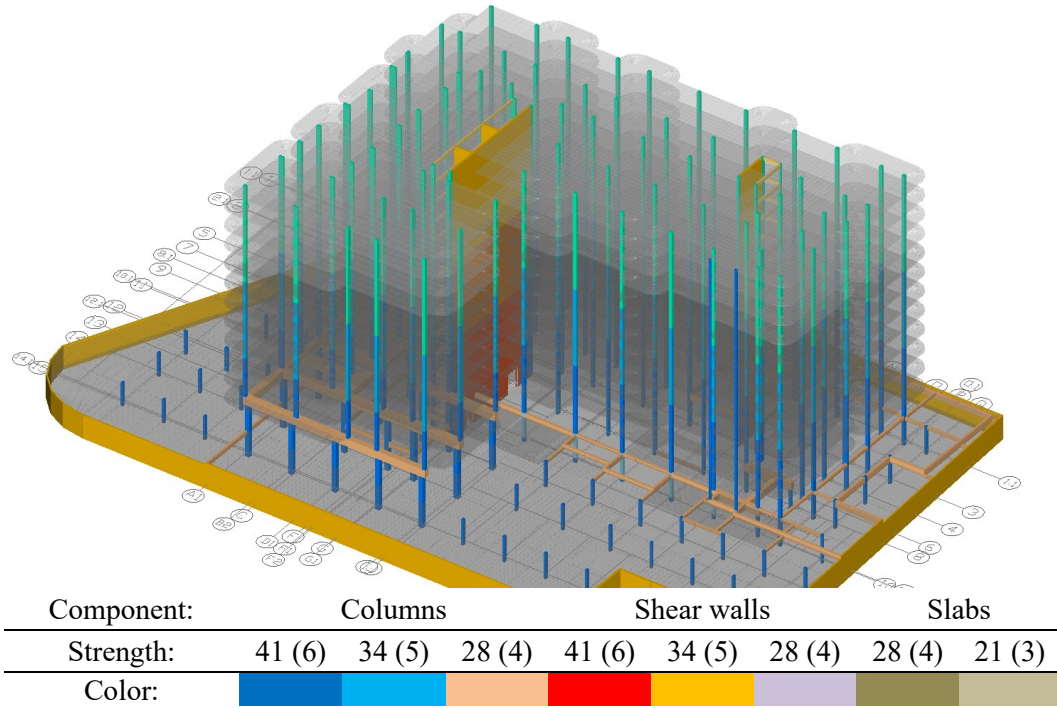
Color map of concrete strength in columns, shear walls, and slabs (a) [MPa (ksi)]
